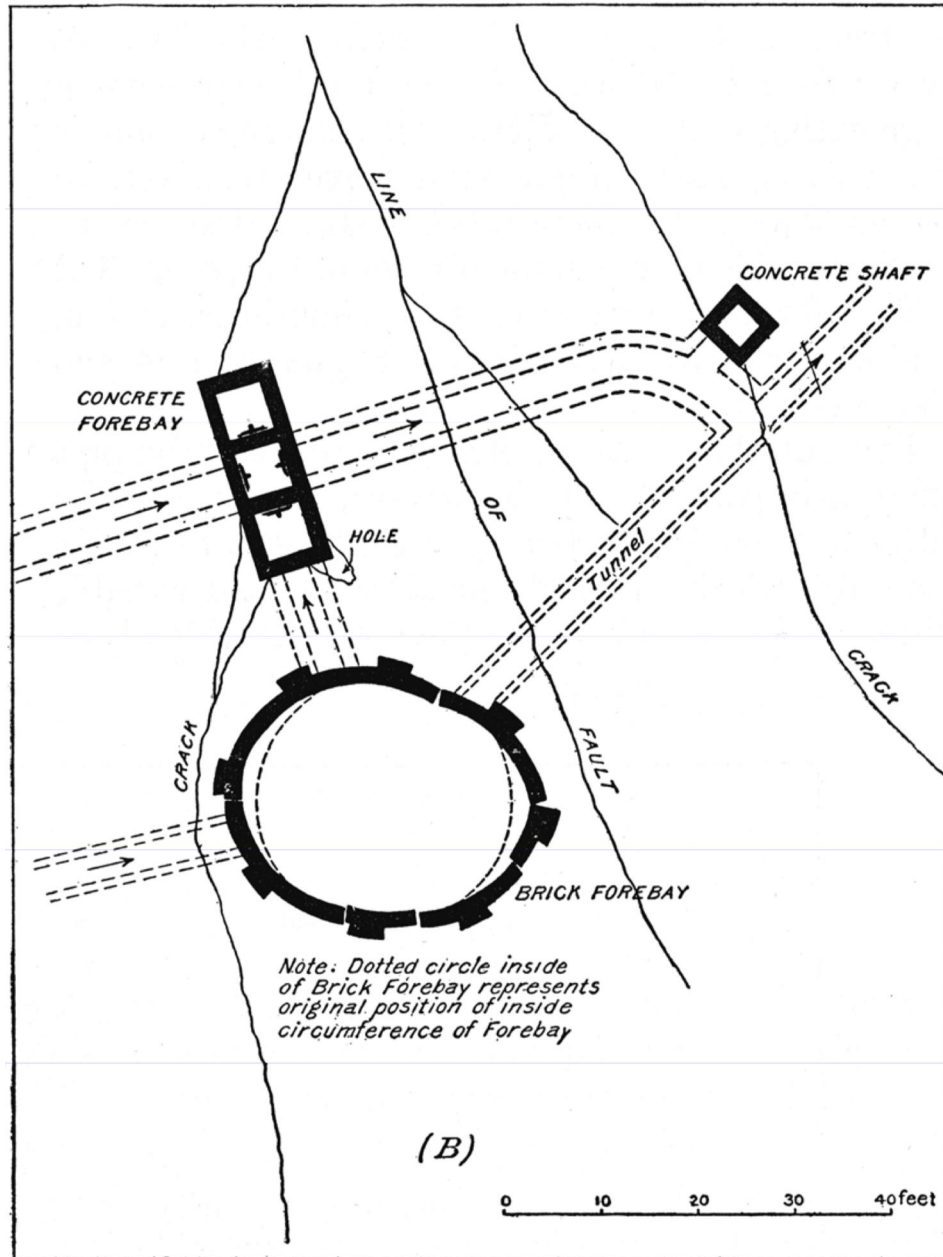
San Andreas Reservoir Outlet Works with Damage (Credit: Schussler)
